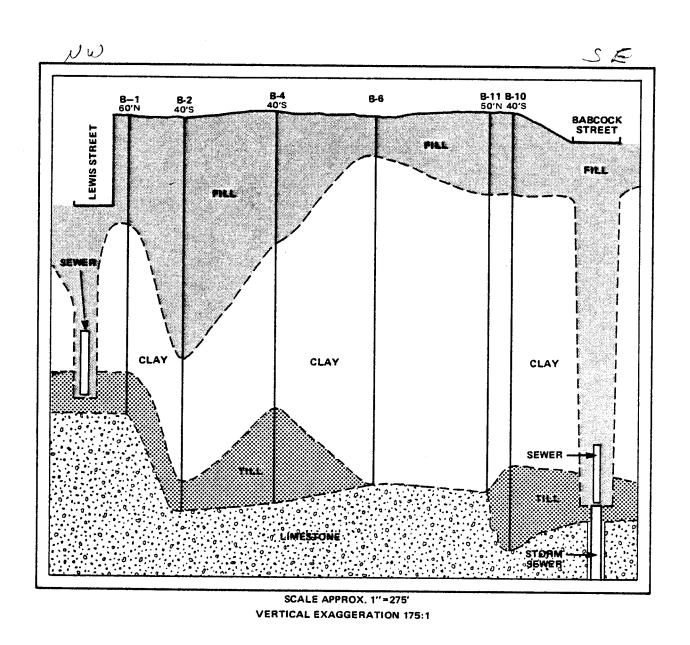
SCHEMATIC CROSS SECTION ALONG CENTERLINE OF SITE
